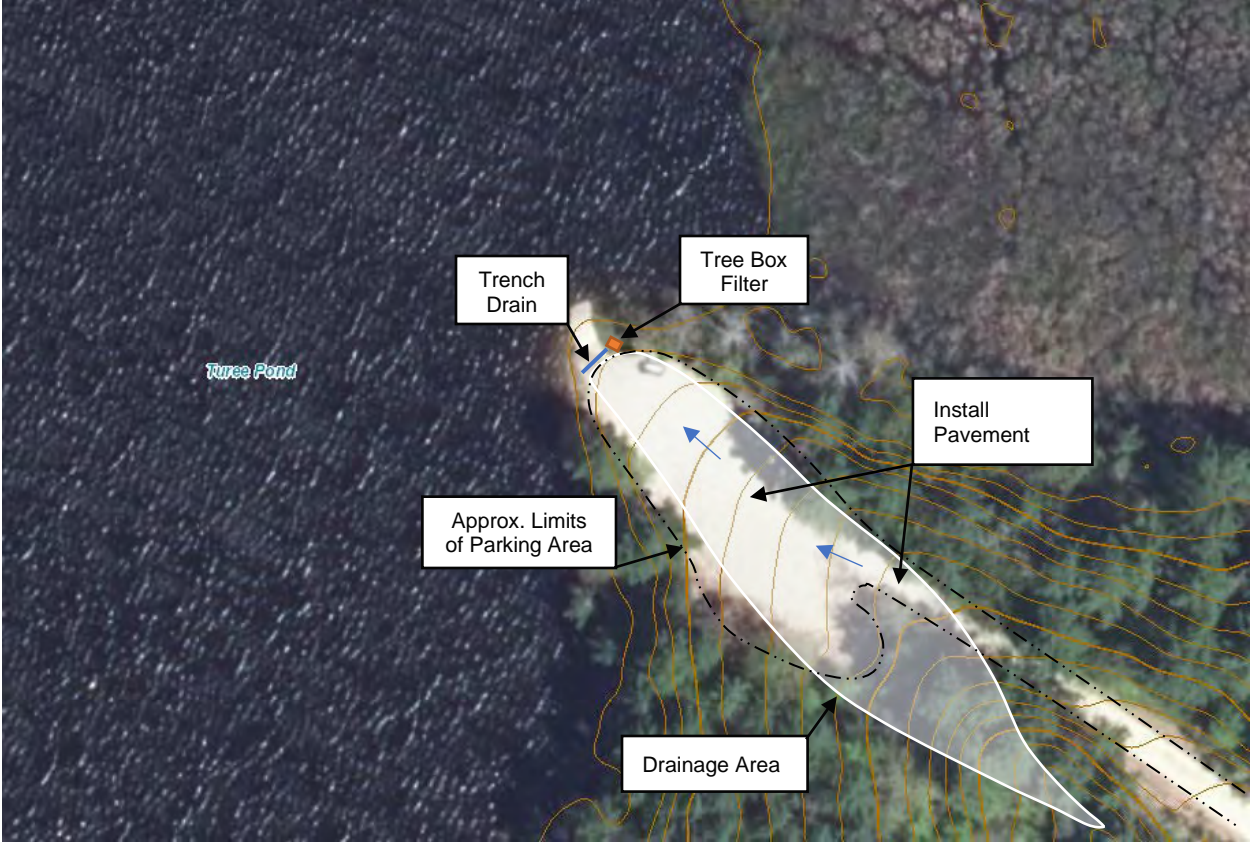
BMP configuration for Turee Pond boat launch/parking area.
